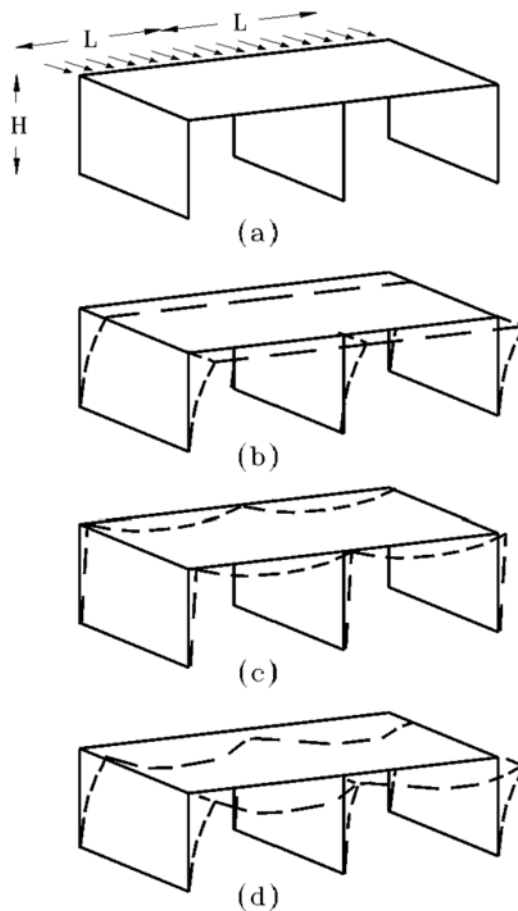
Diaphragm behaviour (a) Loading and building proportions
